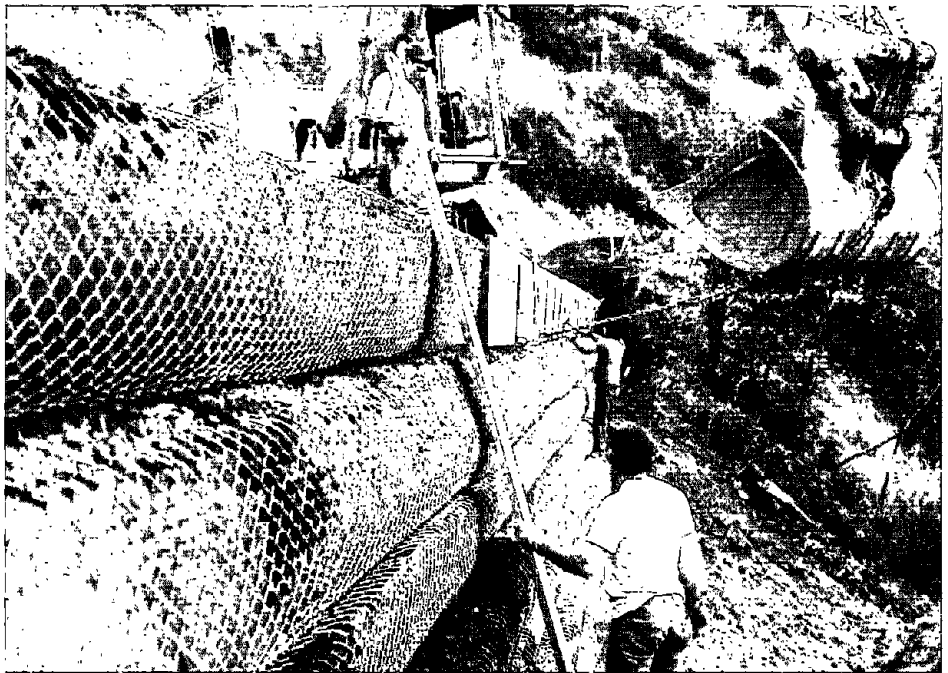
Hilfiker welded wire wall.
